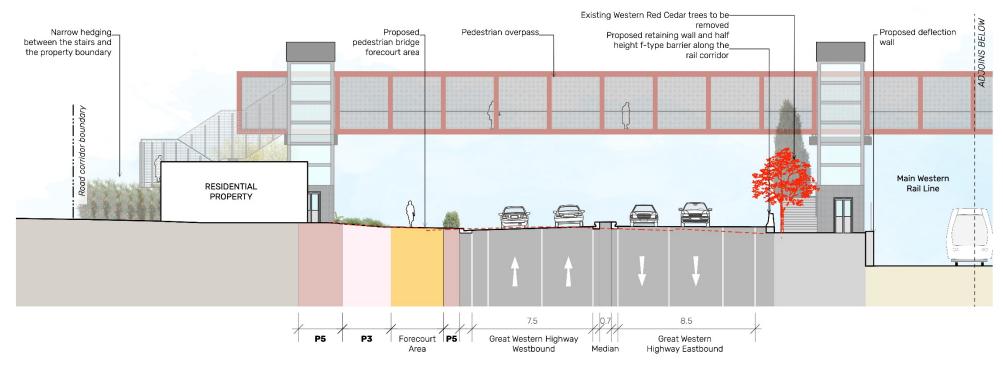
Typical cross section of proposal area adjacent to the station – showing pedestrian bridge (SMM, 2021)
